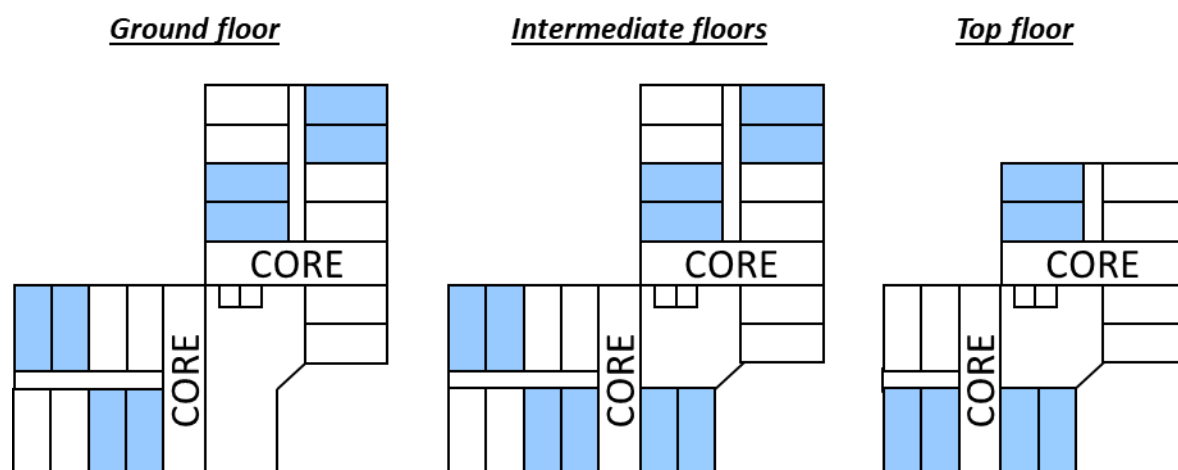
Floor plan of the building in Case Study B (blue shading is double bedroom apartment and white shading is single bedroom apartment layout).
